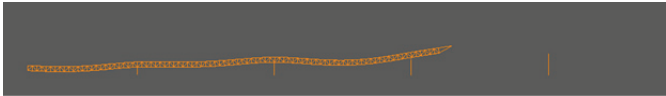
One of more than 130 launch stages analyzed in developing the construction plan.
